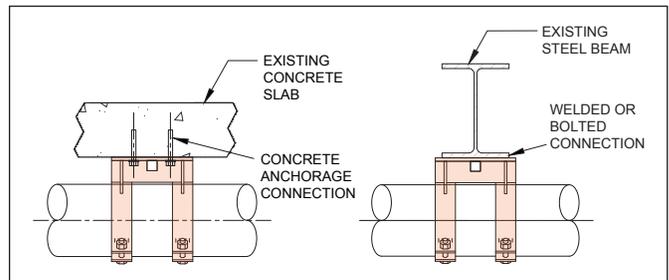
TYPICAL INSTALLATION OF PRODUCT A84 TO CONCRETE AND STEEL STRUCTURE
